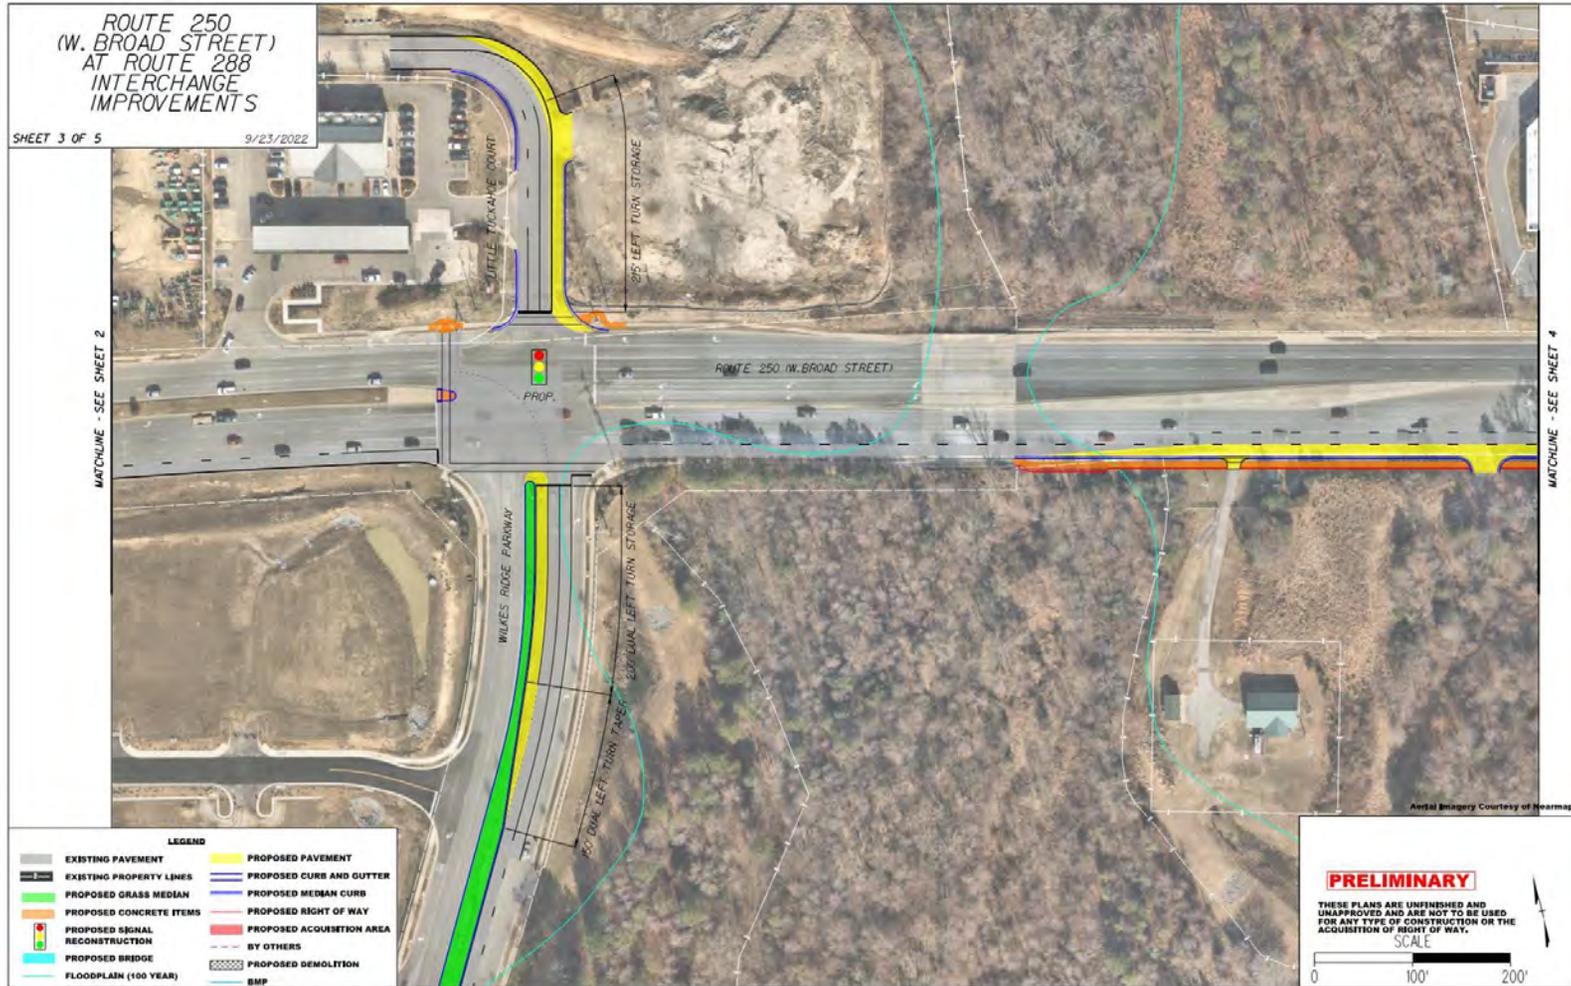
Route 288 at US 250 Ramp and Ramp Terminal Improvements (5)
